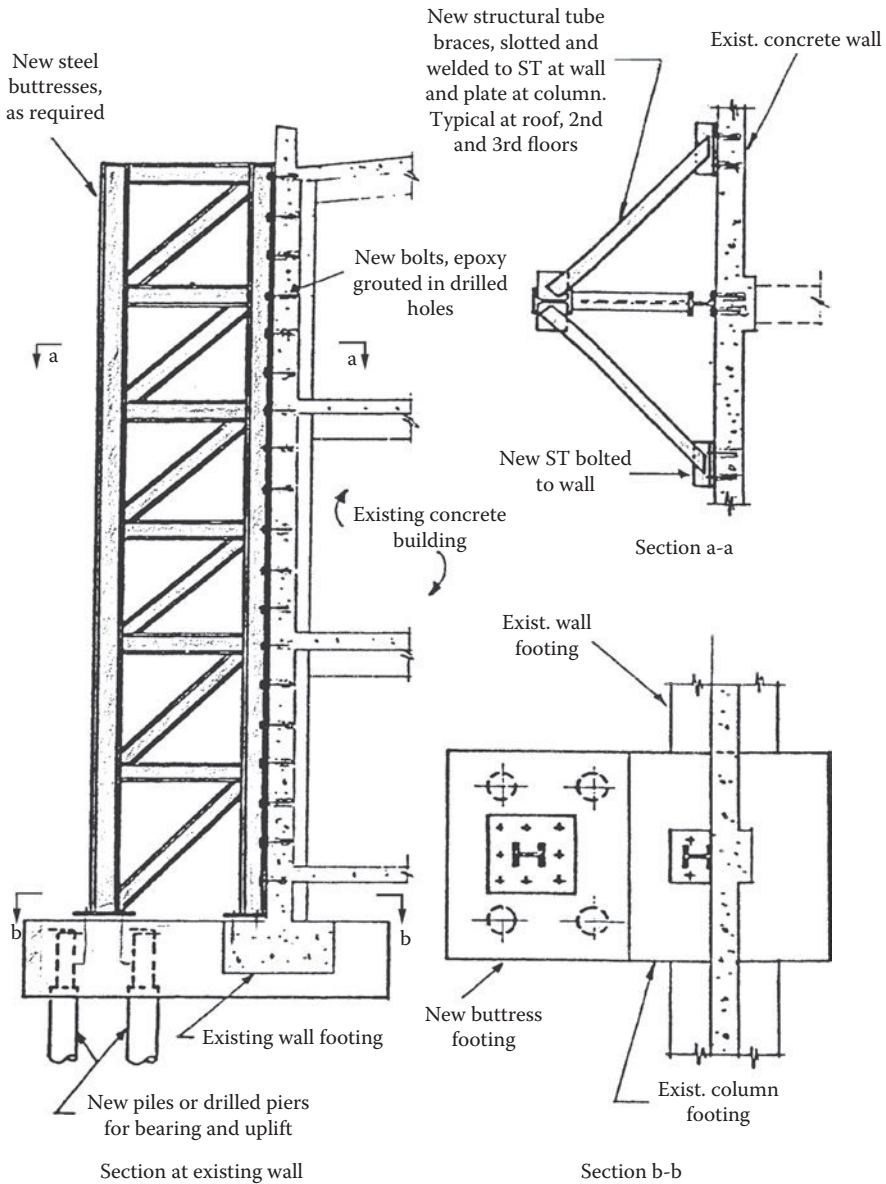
Braced structural steel buttresses to strengthen an existing reinforced concrete building.
